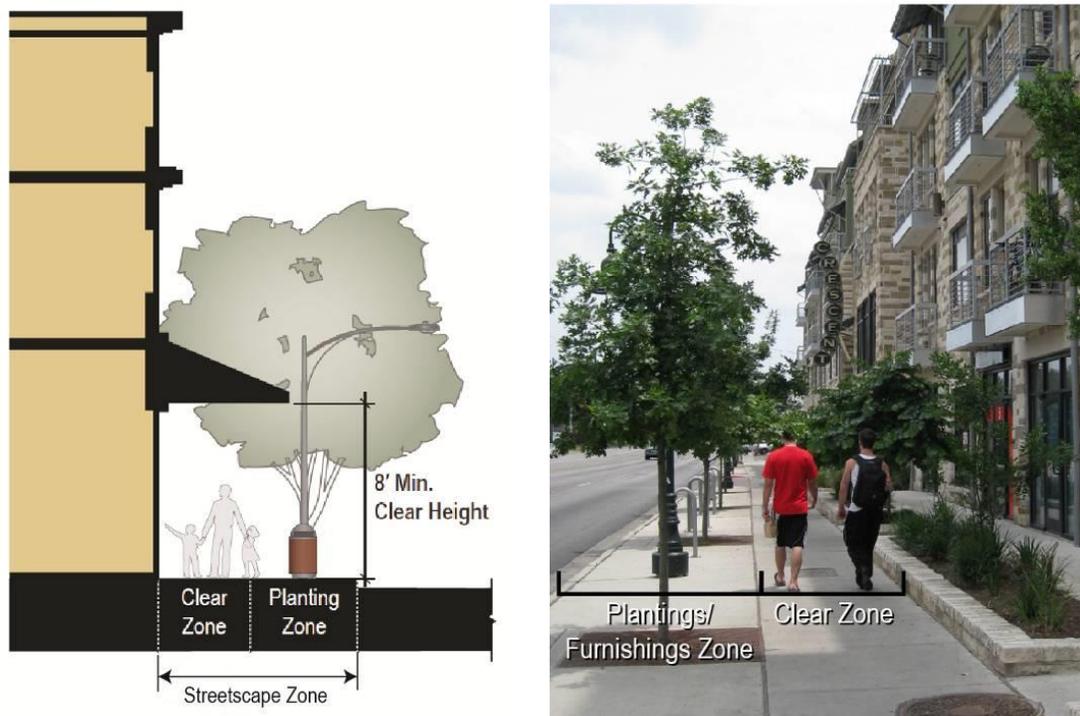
Illustrations delineating the Streetscape Zone elements
